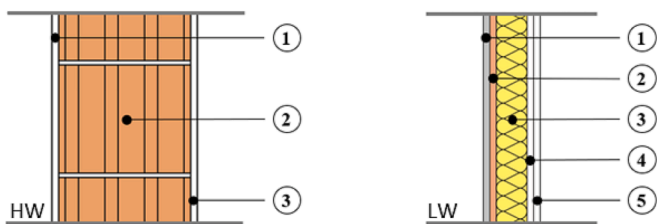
Experimented walls, heavyweight new wall HW and lightweight wall LW.
